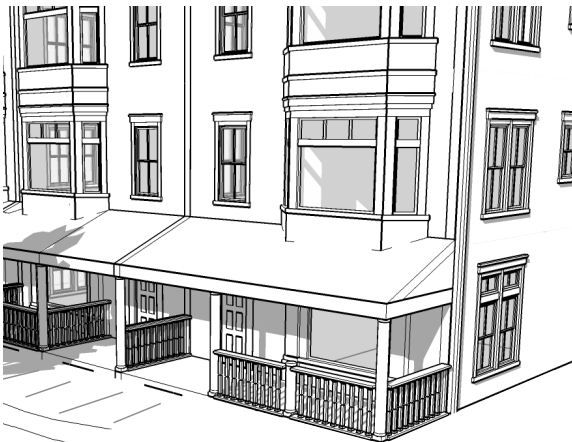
d.2.d. An 80 square foot ground floor porch area and transparent fencing enhances a sense of privacy.
